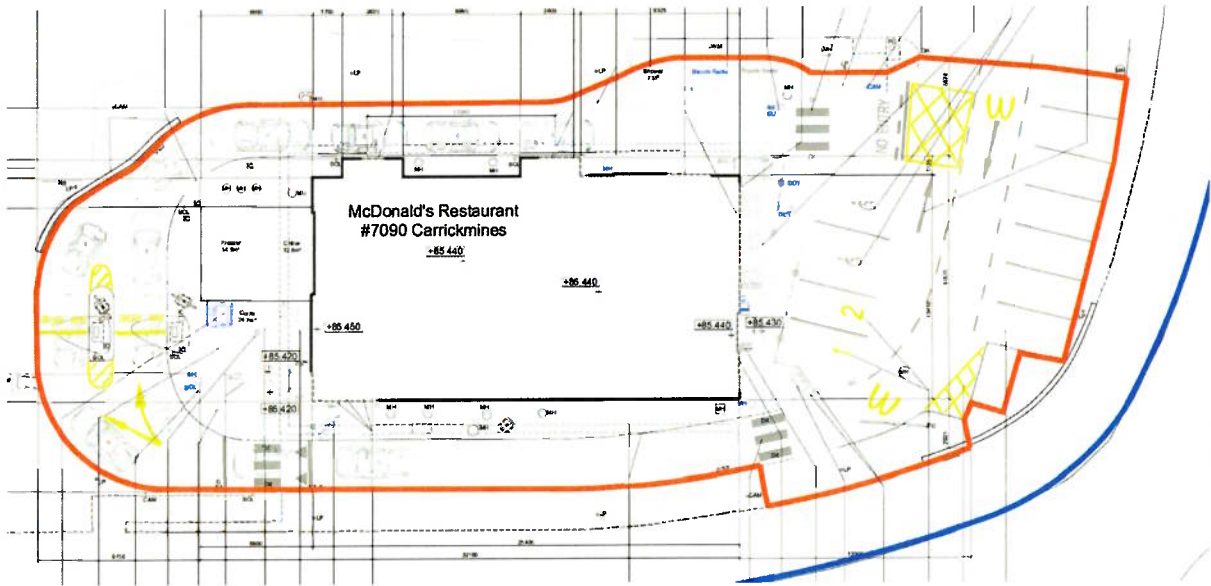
Existing Site Layout Plan (subject site outlined in red)
